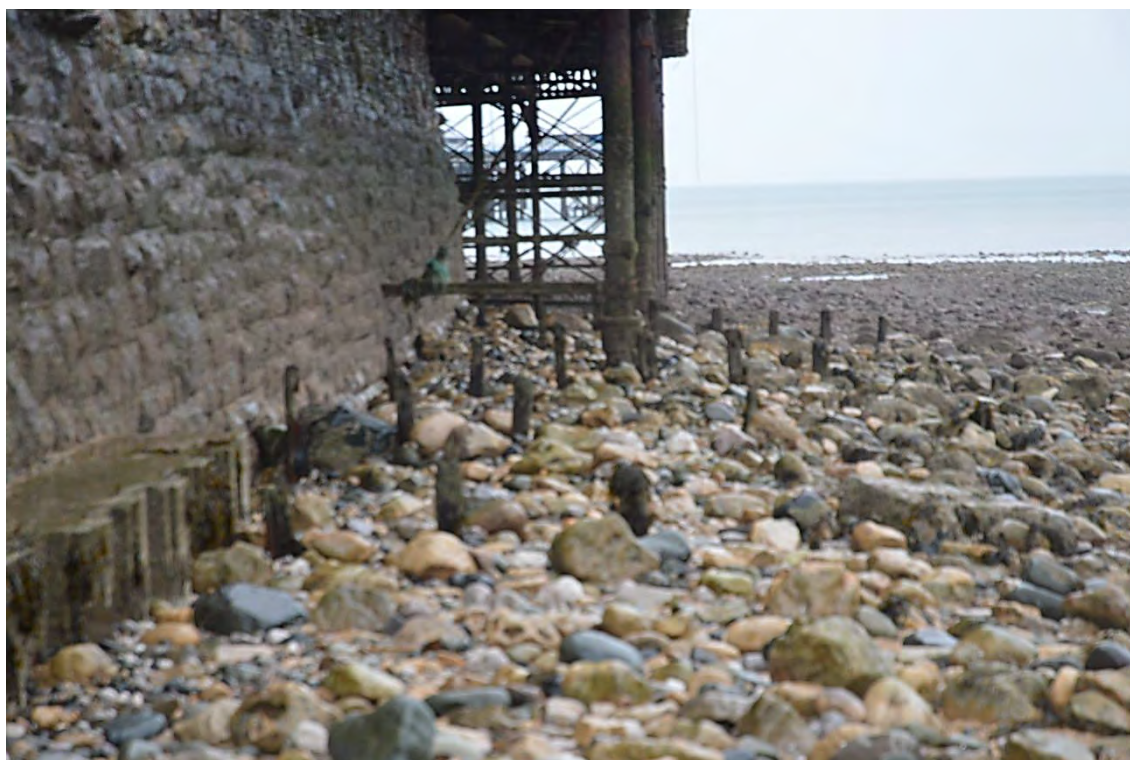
and 17b: Wooden exposure near jetty on the North Shore. Facing E.
